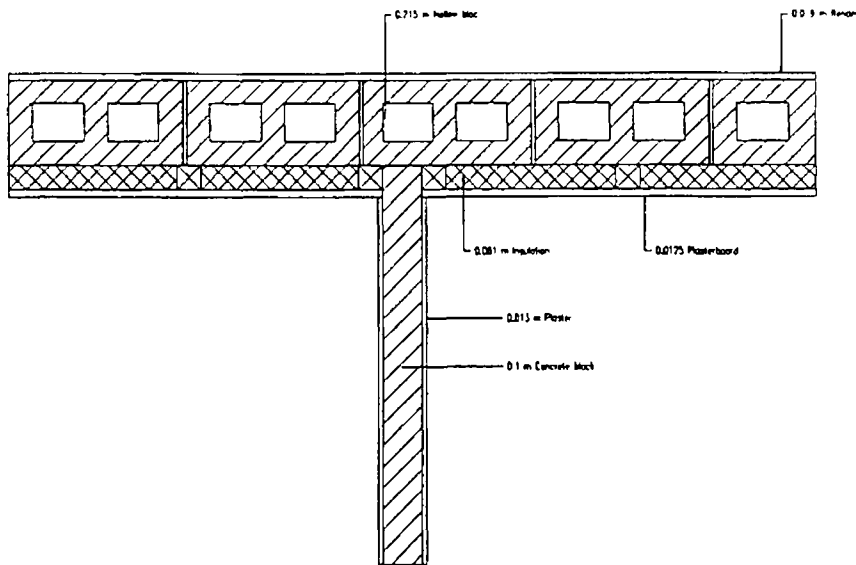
3 1 Semi-Detached House Solid Partition Wall and External Wall
